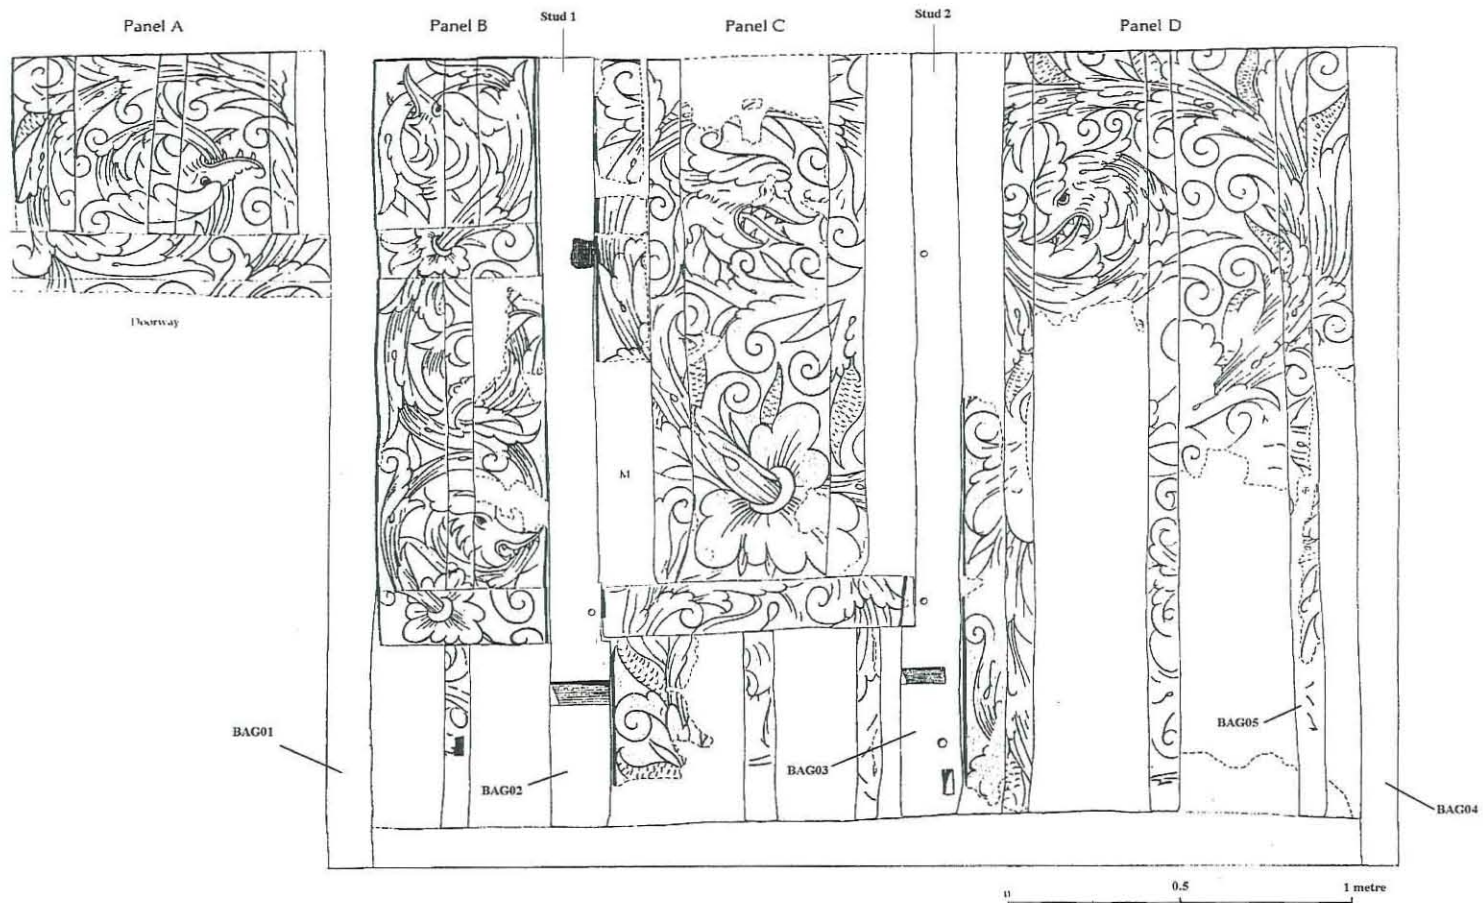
South wall elevation showing the locations of samples taken for dendrochronology (adapted from an original by David Williams)
